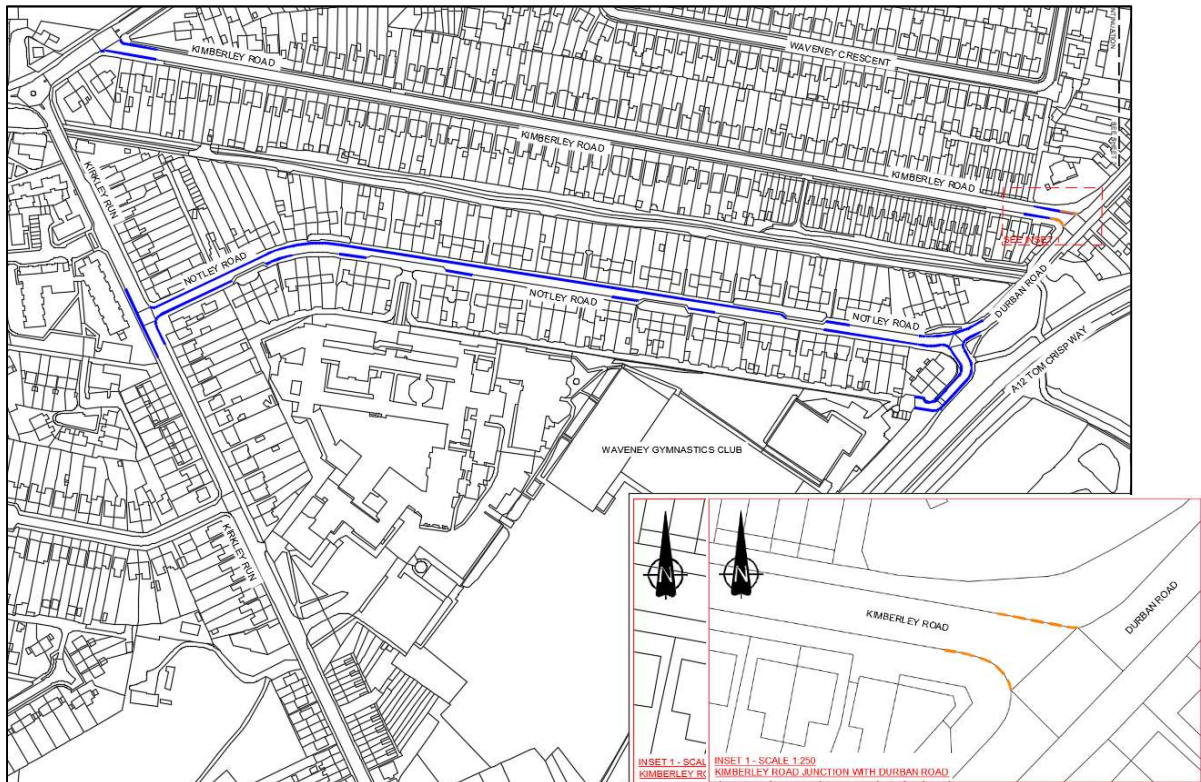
Proposed Parking Restrictions on Notley Road and Kimberley Road
